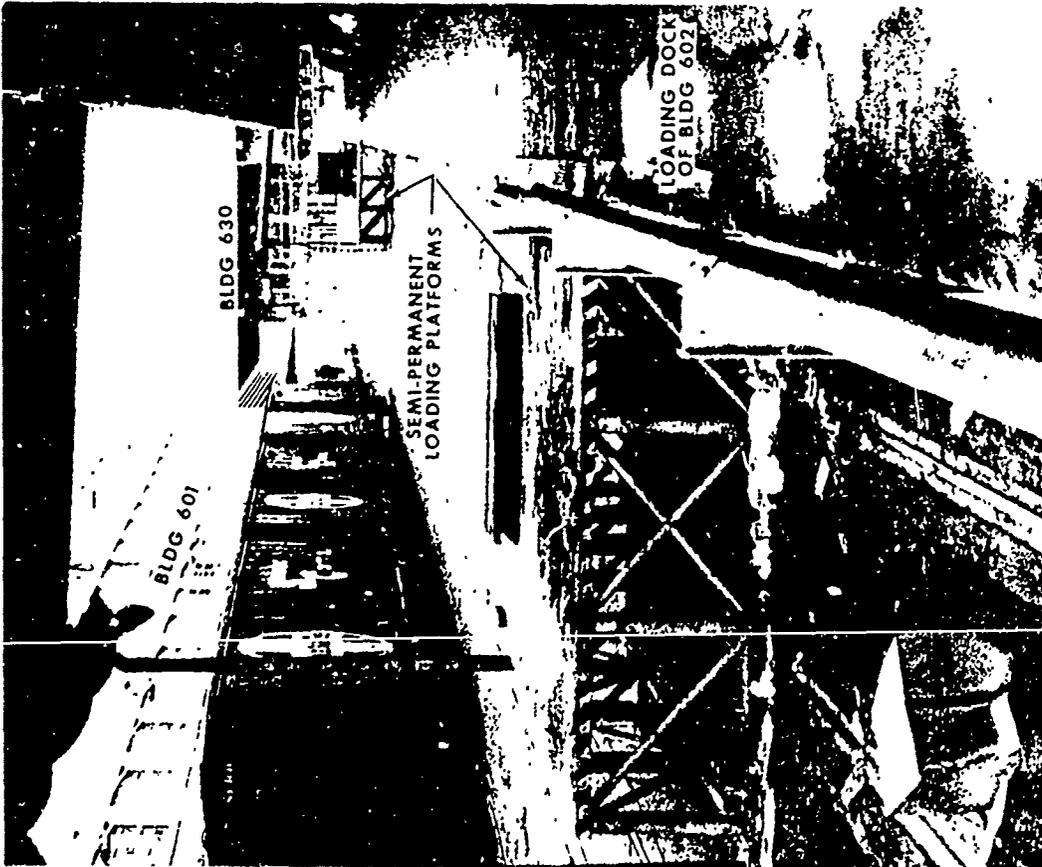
Loading platforms on east side of Building 602 (southward view).
